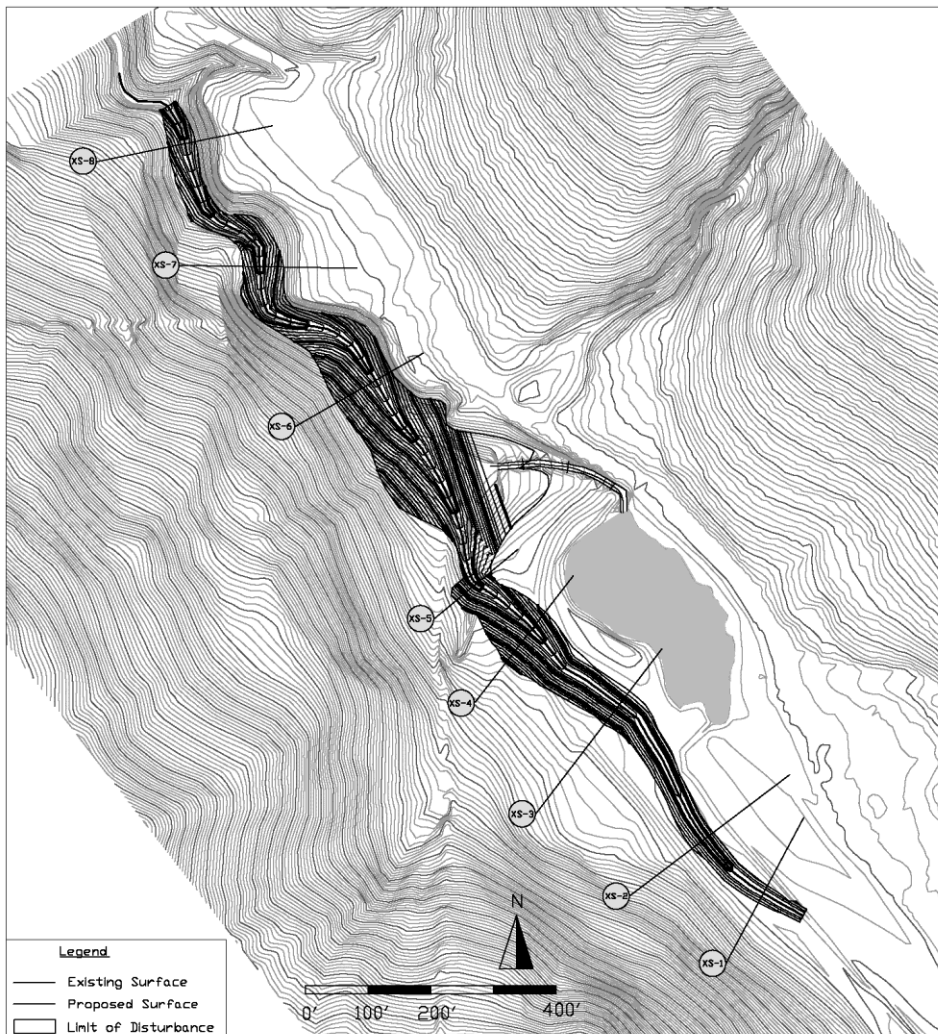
Conceptual grading plan for the Jewel Lake bypass alternative.
